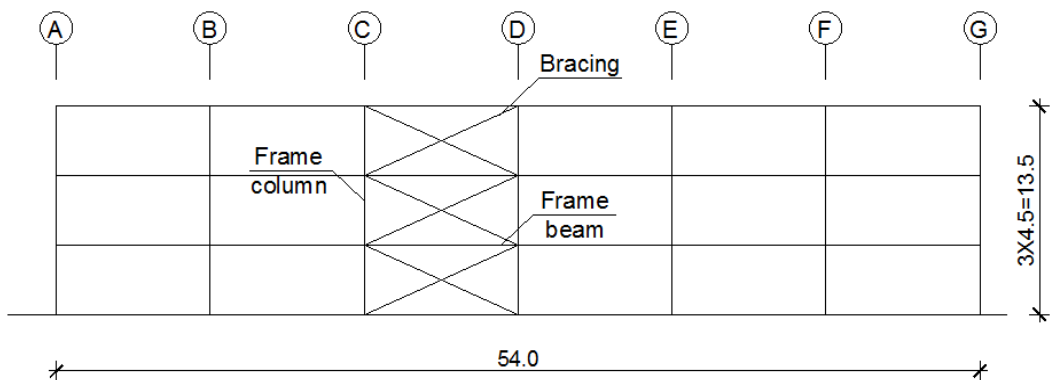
Model building elevation - 3-story CBF, $q = 4$
